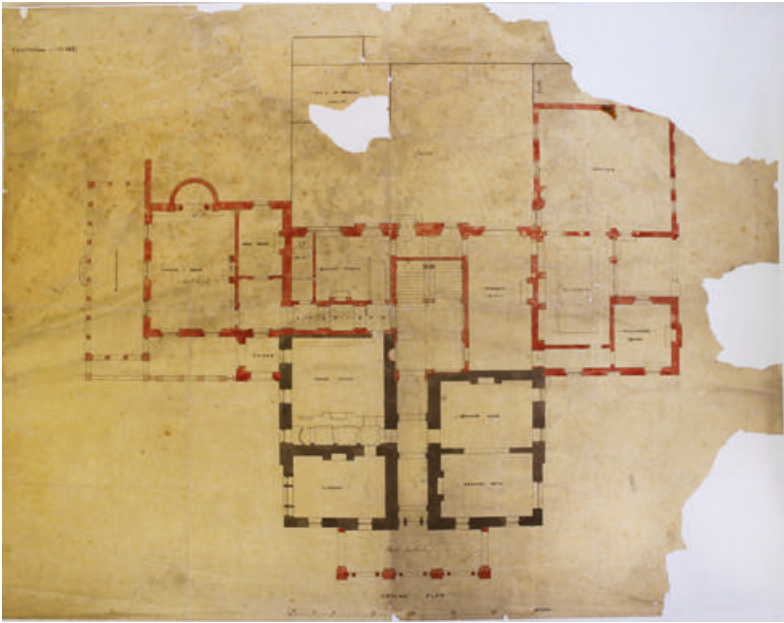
David Brandon, plan of Fonthill House, formerly the Pavilion.
